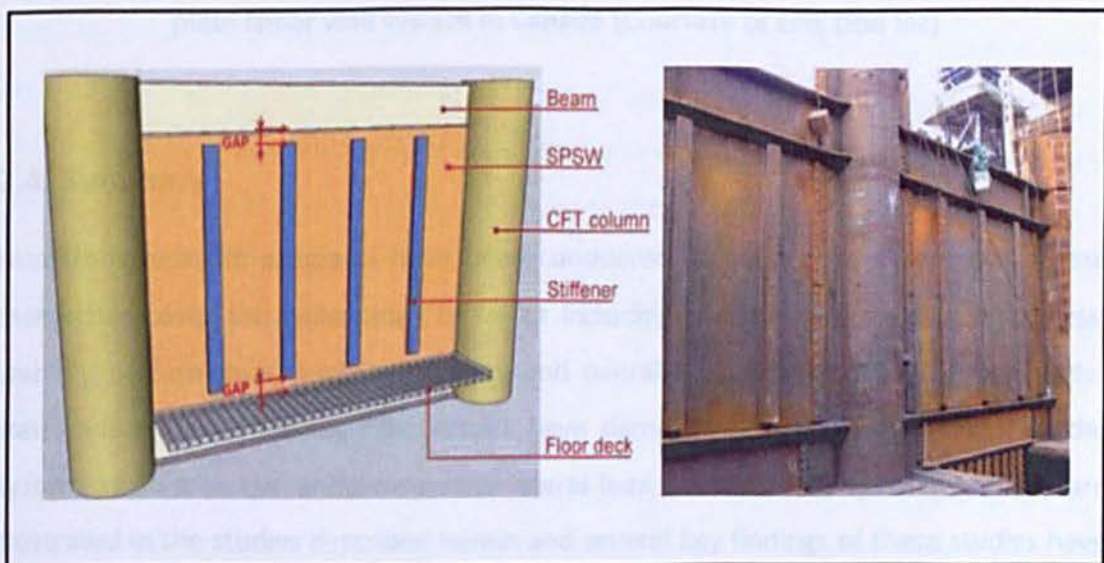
Stiffened shear panels adopted in Jinta tower
